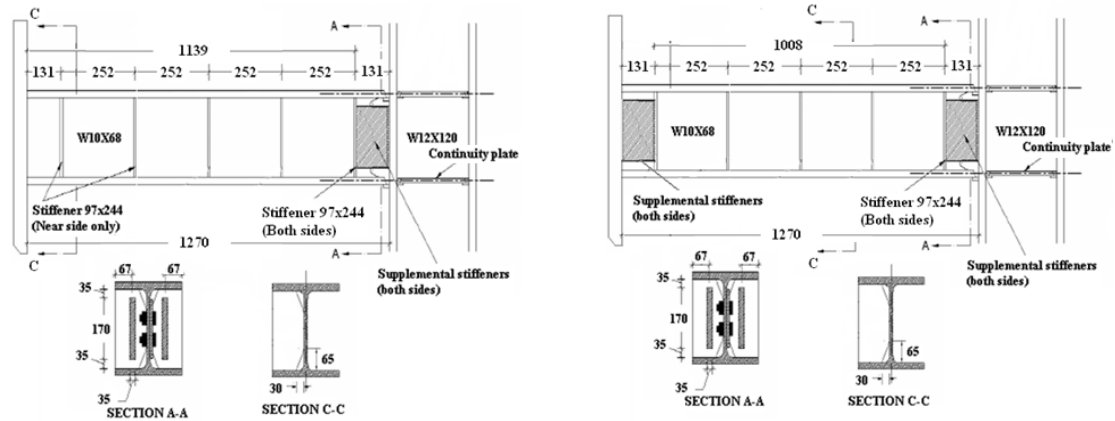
(a) (1-I-AISC-6) Specimen Overall layout (Dimensions in mm)
